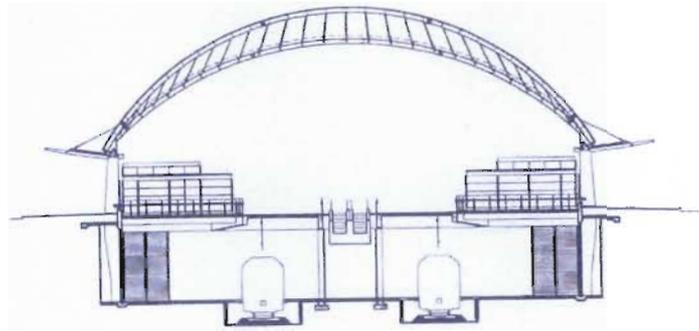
A Cross section through the Olympic Park Station showing the voluminous interior capped by a lightweight steel canopy (Caro, 1998: 61)
